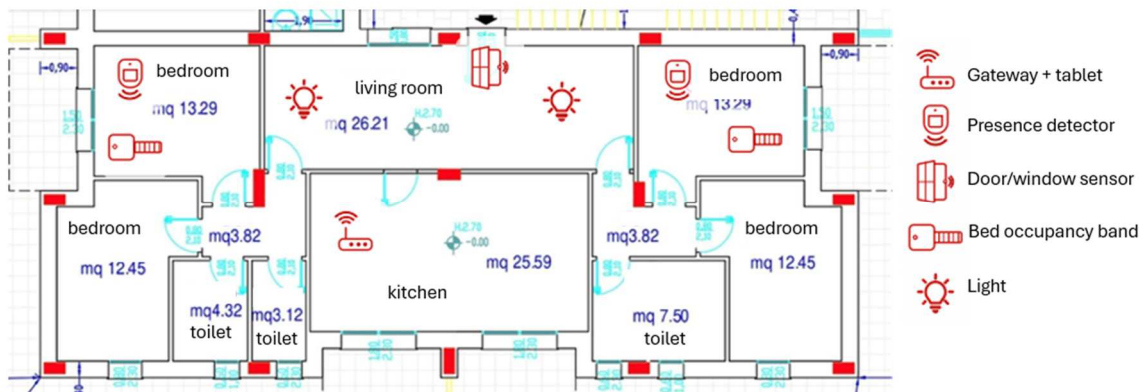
Floor plan of the "Dopo di Noi" apartment with sensor layout.
